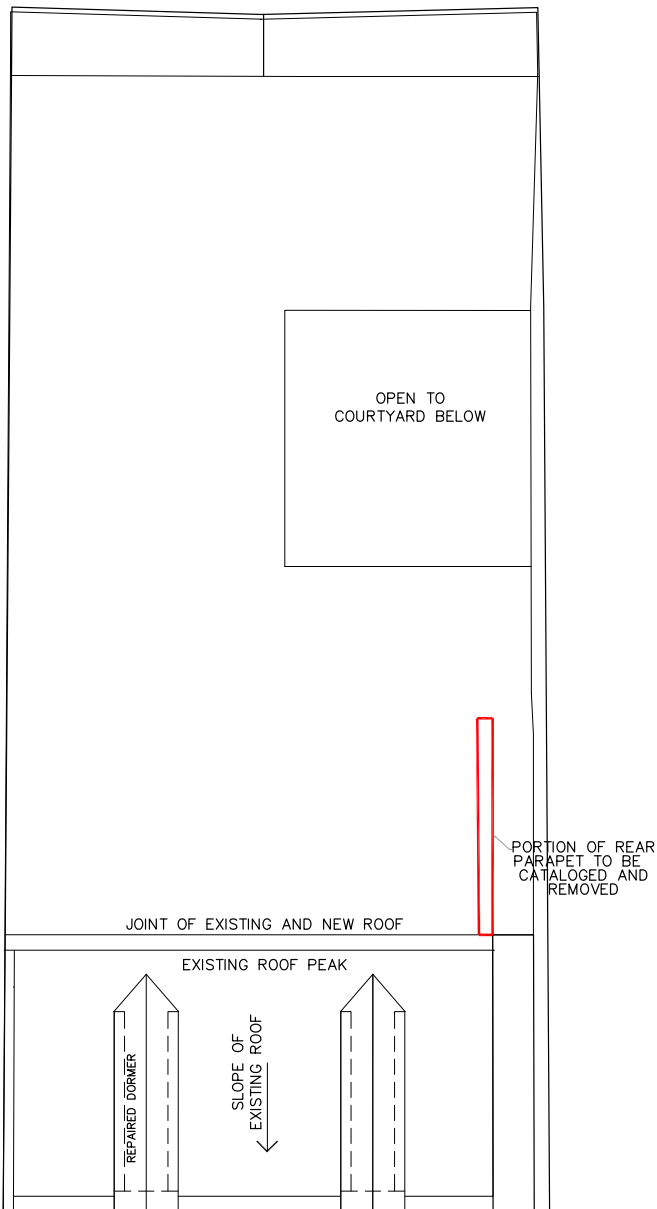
Drawing showing new roof plan with existing parapet to be removed highlighted.
